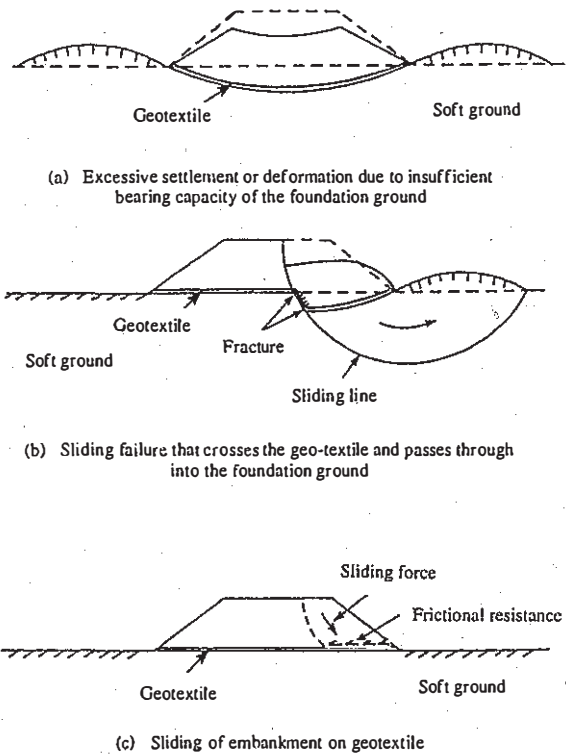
Modes of failure in embankment on soft ground reinforced with geotextile
